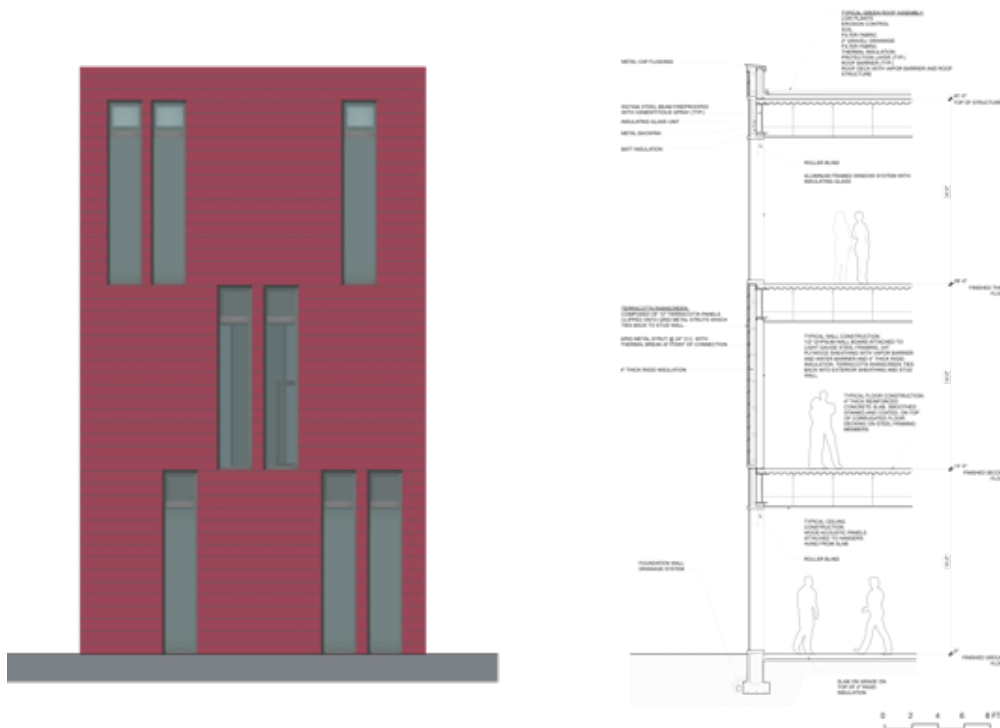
Partial elevation & wall section detail of terracotta wall system design (source: author)
